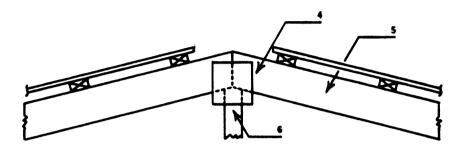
Location of test sites, Barn F. Truss No. 2, 29.2m (104') from north end. North elevation. Molded flashing not shown.
